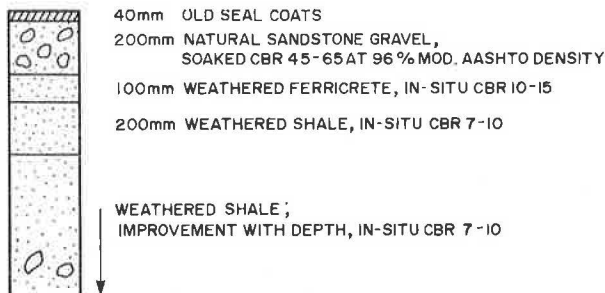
Pavement structures tested on Roads P6/1 and P123/1.
